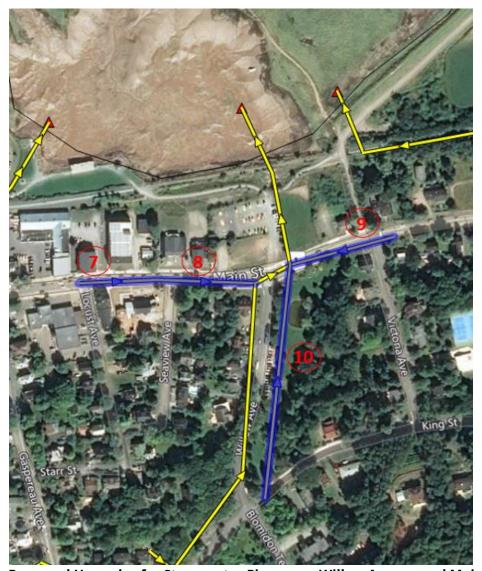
Proposed Upgrades for Stormwater Pipes near Willow Avenue and Main Street
